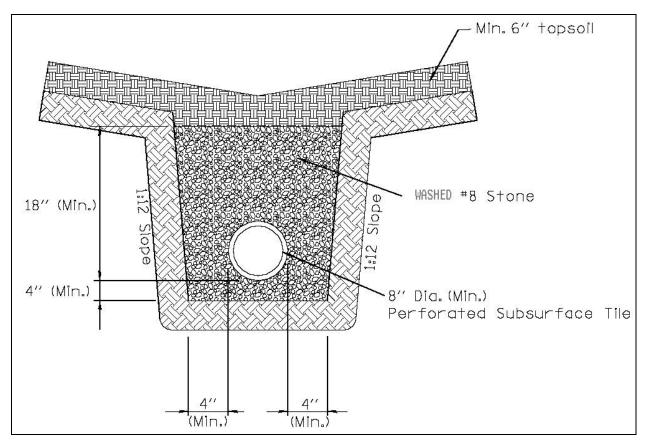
Bedding and Backfill Standards for Sub-drains under Swales
